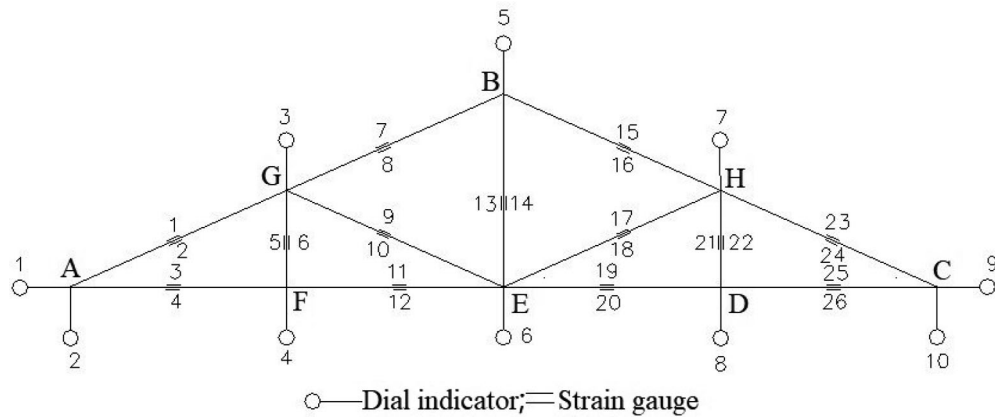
Arrangement of measuring locations for the truss specimens DC-HJ1 and DC-HJ2
